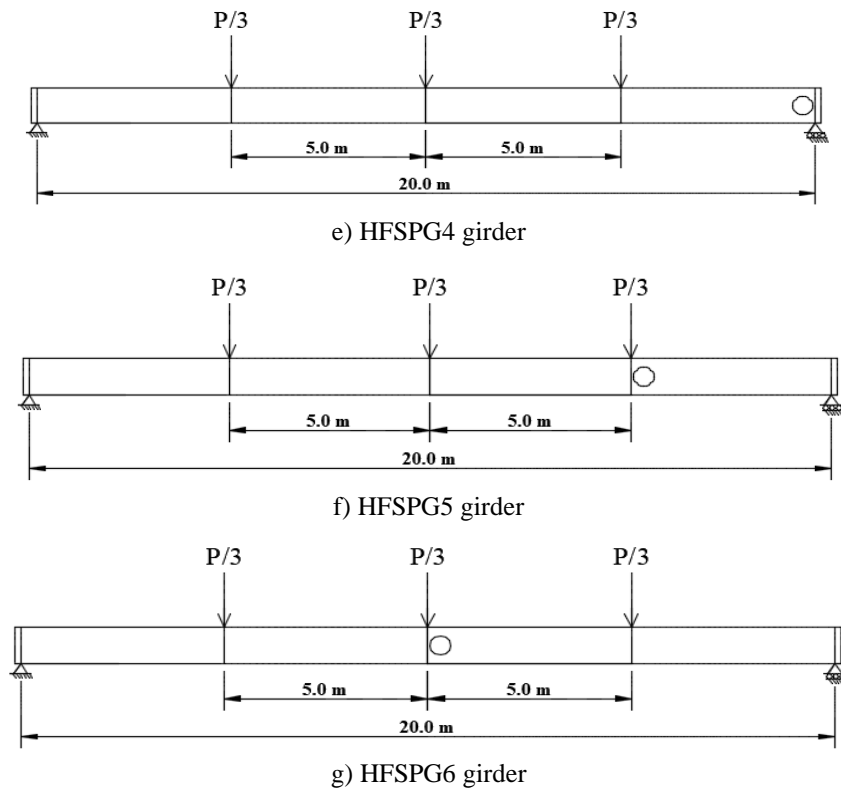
Geometry, support and loading for the proposed steel plate girders.
